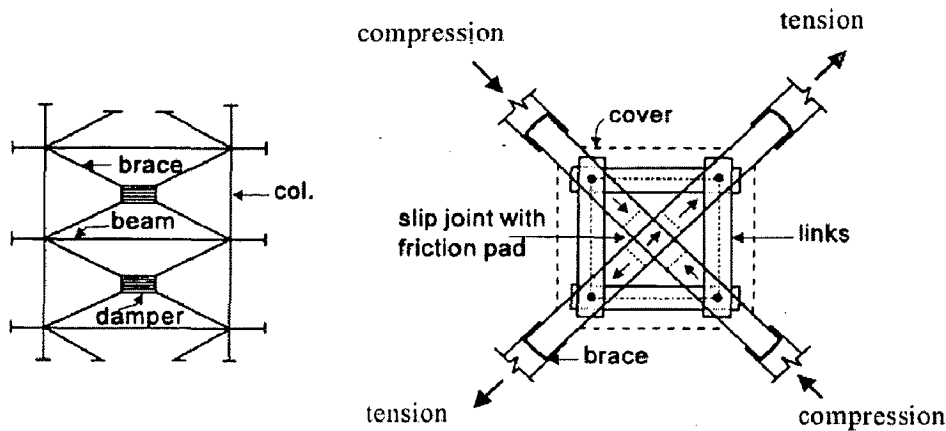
Installation of Pall friction damper in conjunction with cross bracing [18].
